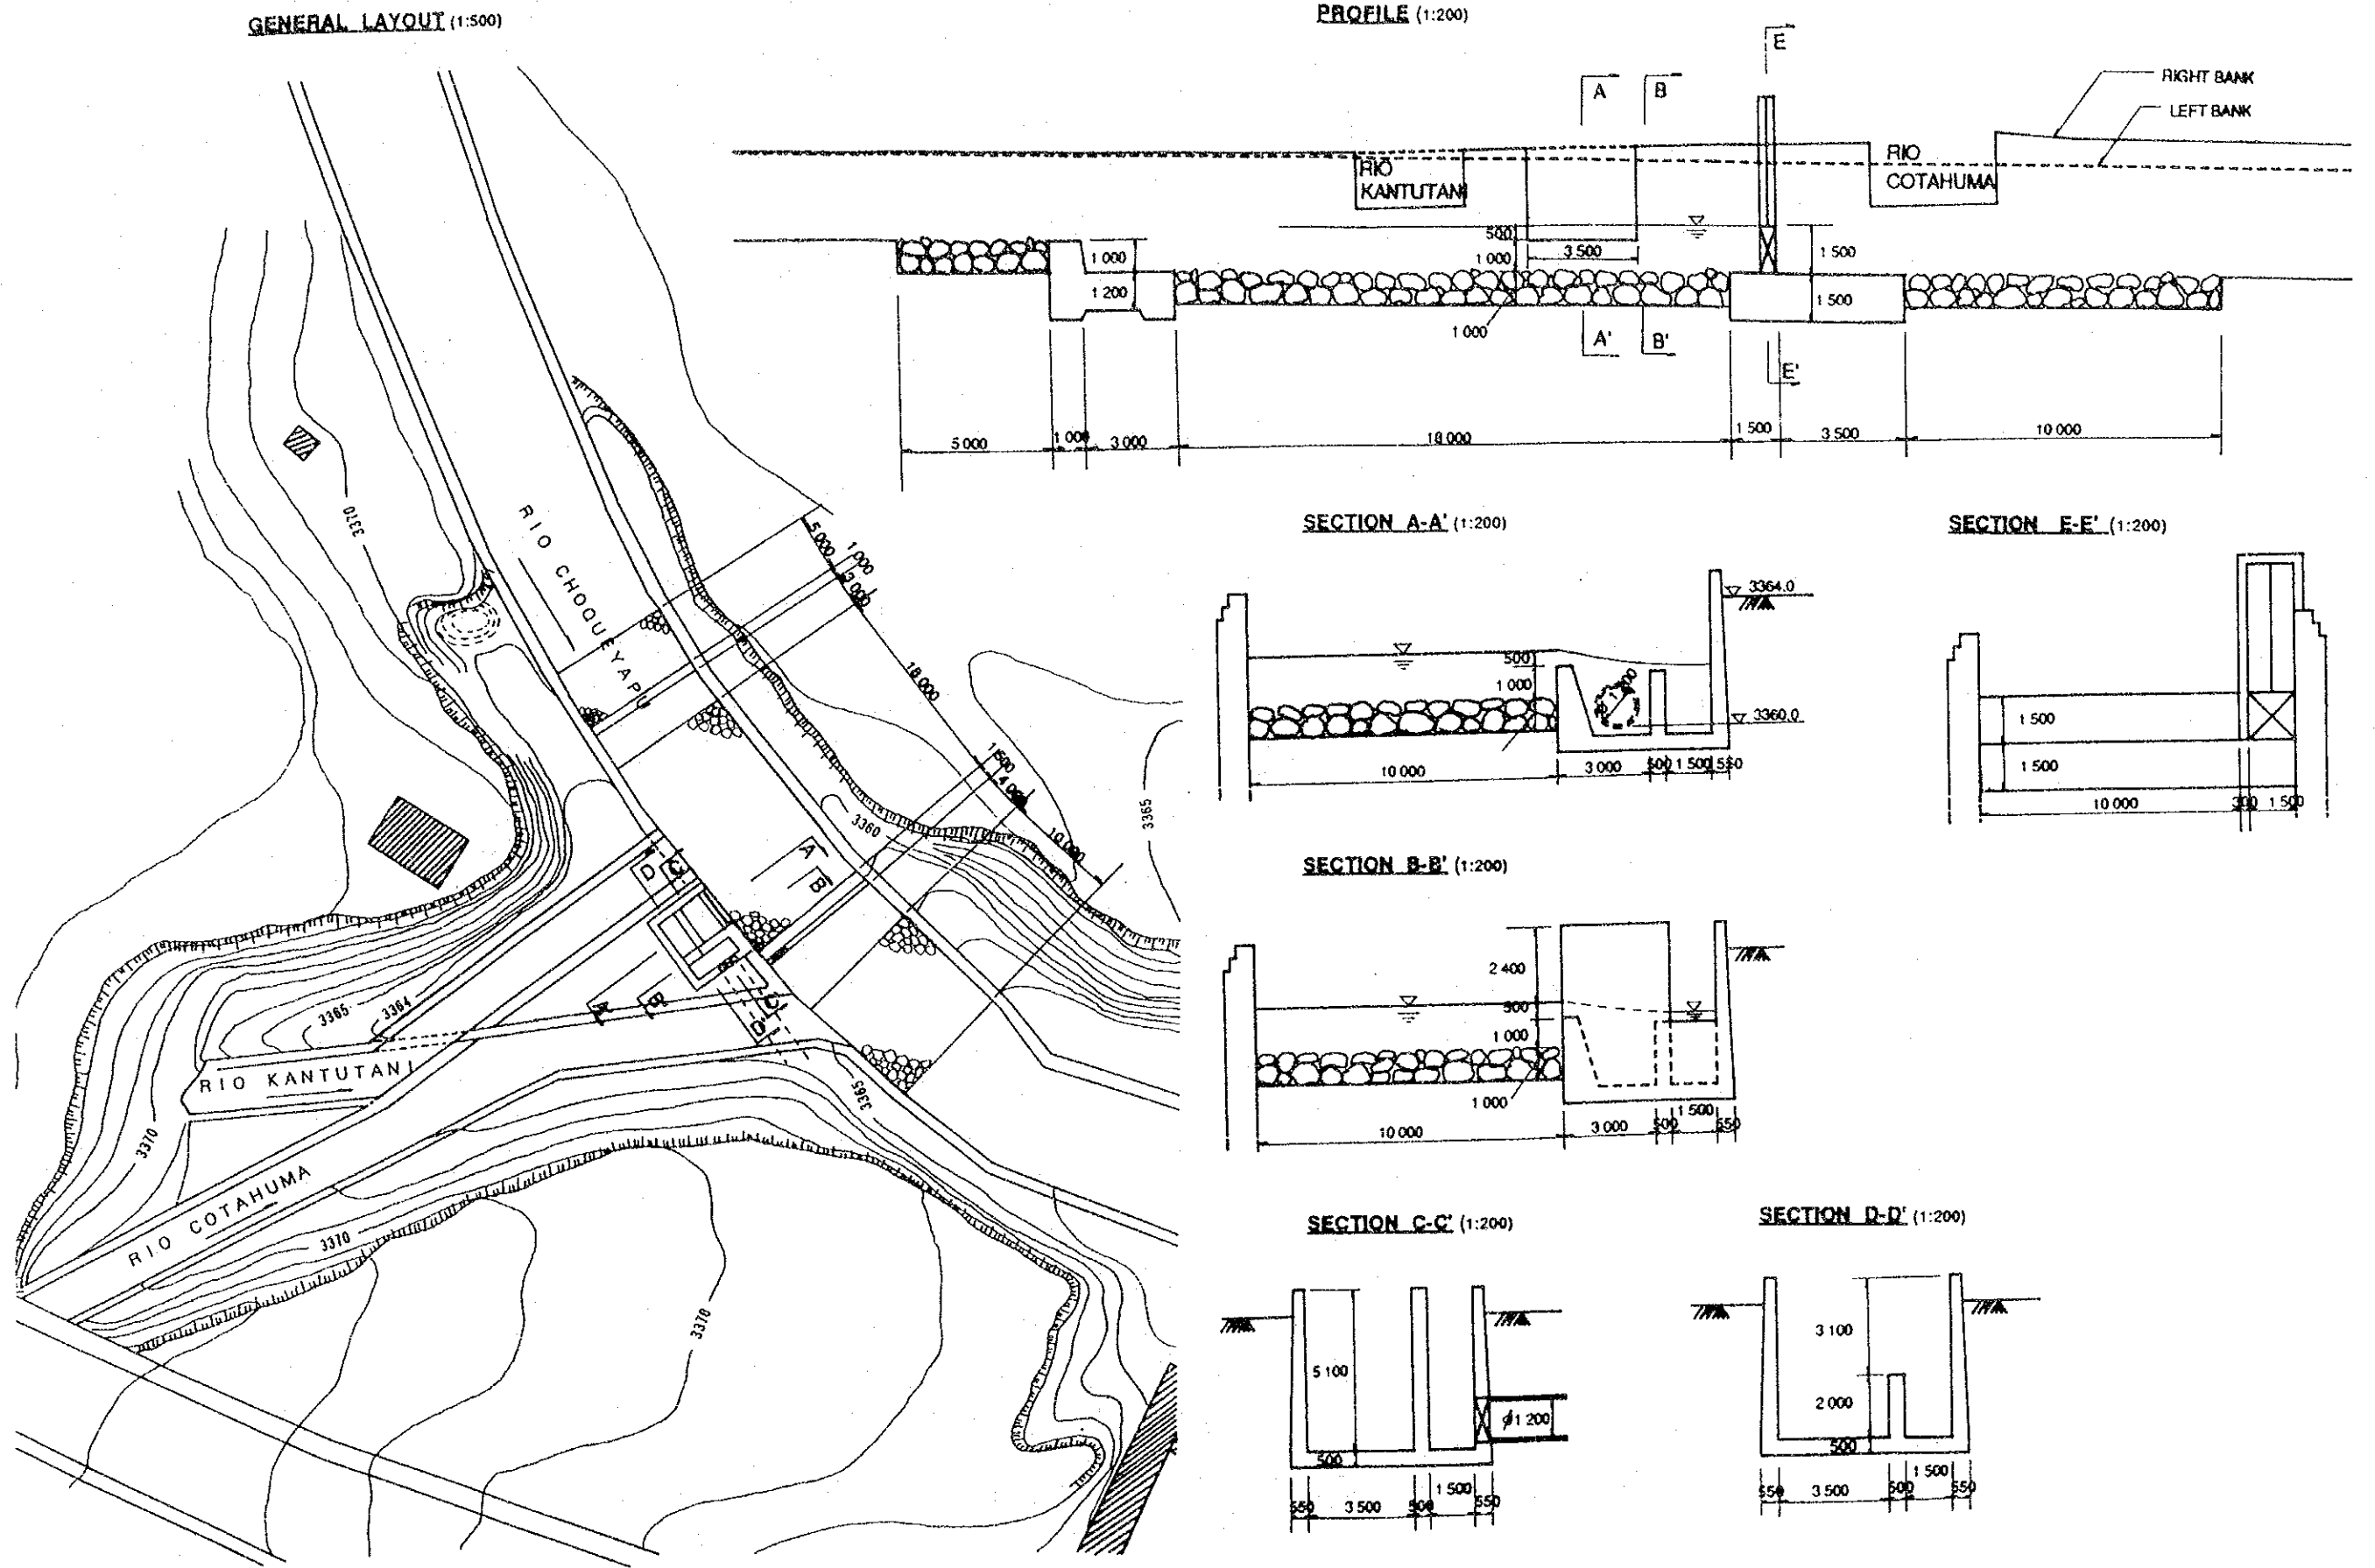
General Layout and Profiles of Water Intake Facilities
